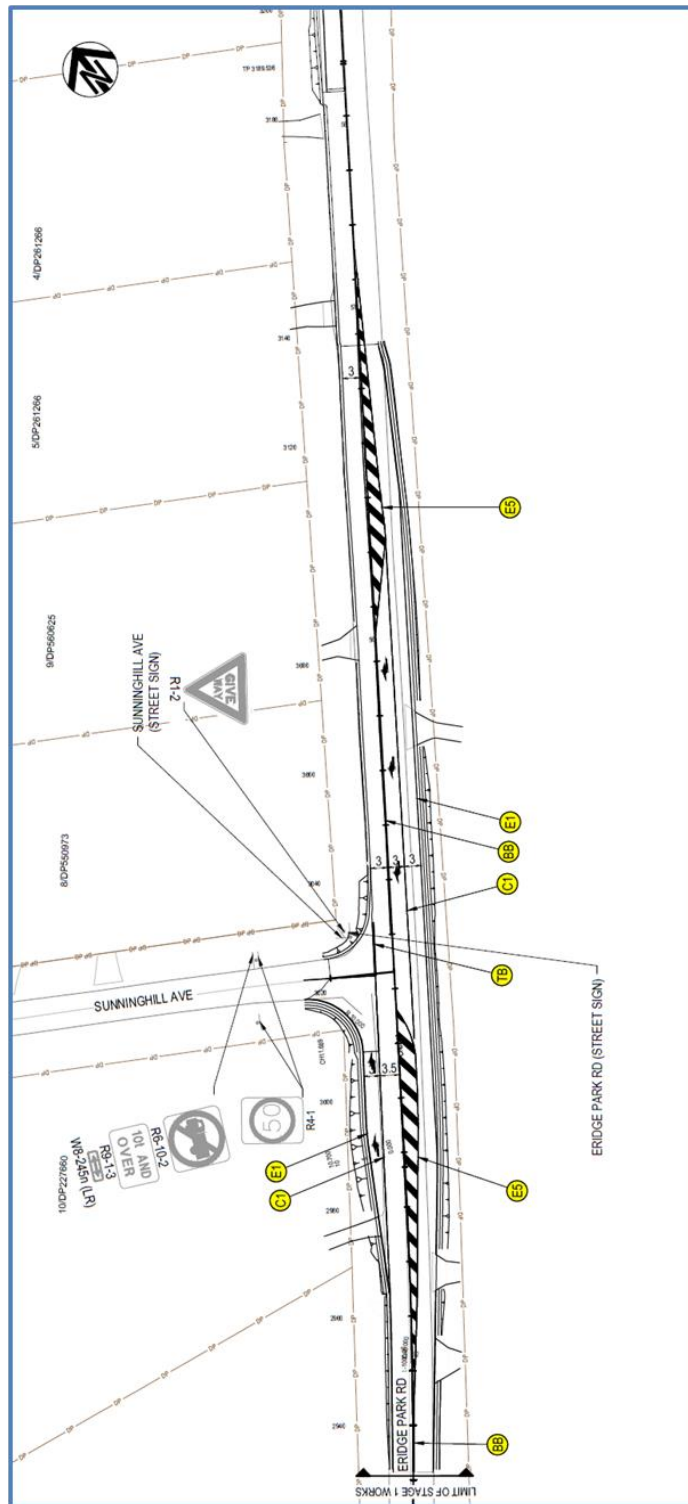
CHR Treatments plan for Sunninghill Ave and Eridge Park Rd T-Intersection
